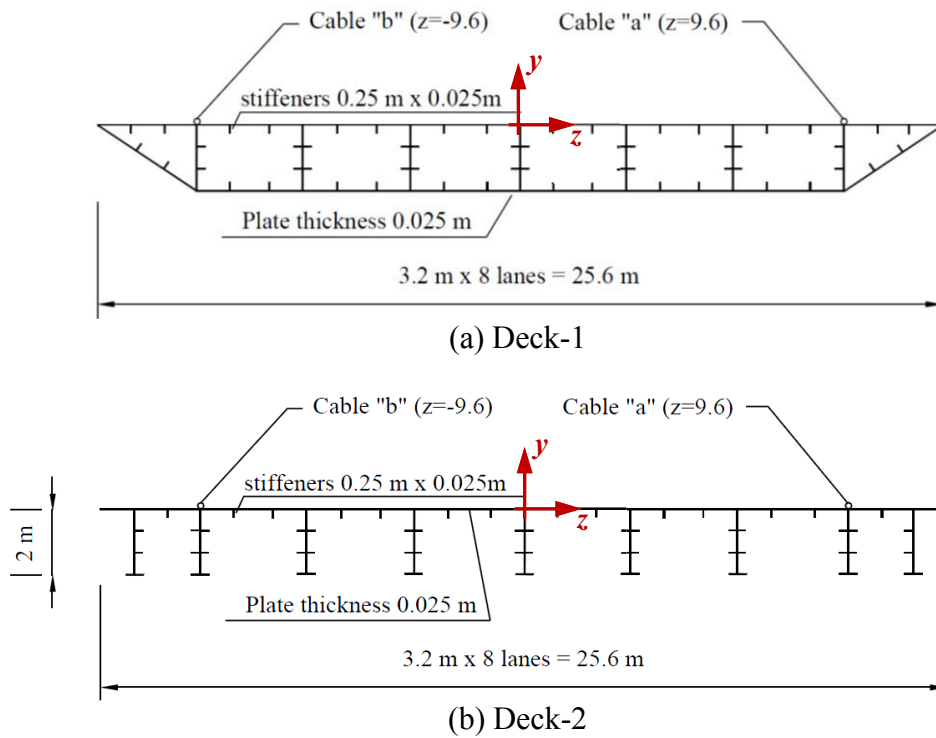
Cross section of the deck (a) box girder (b) open orthotropic deck.
